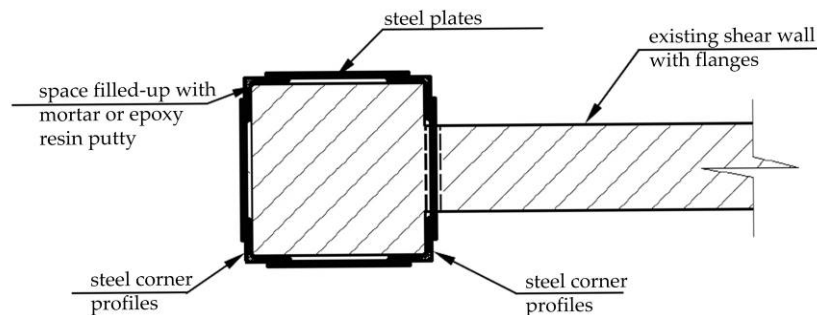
Strengthening solution for structural walls, with steel jacketing interventions on the edges (adapted after [25]).
